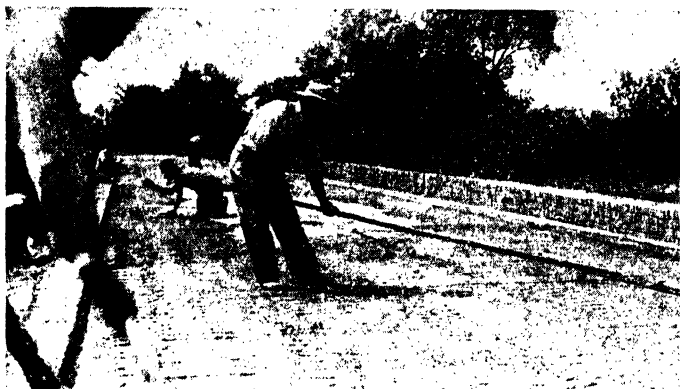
Truing a widened concrete slab with cement mortar preparatory to adding a brick surface.
